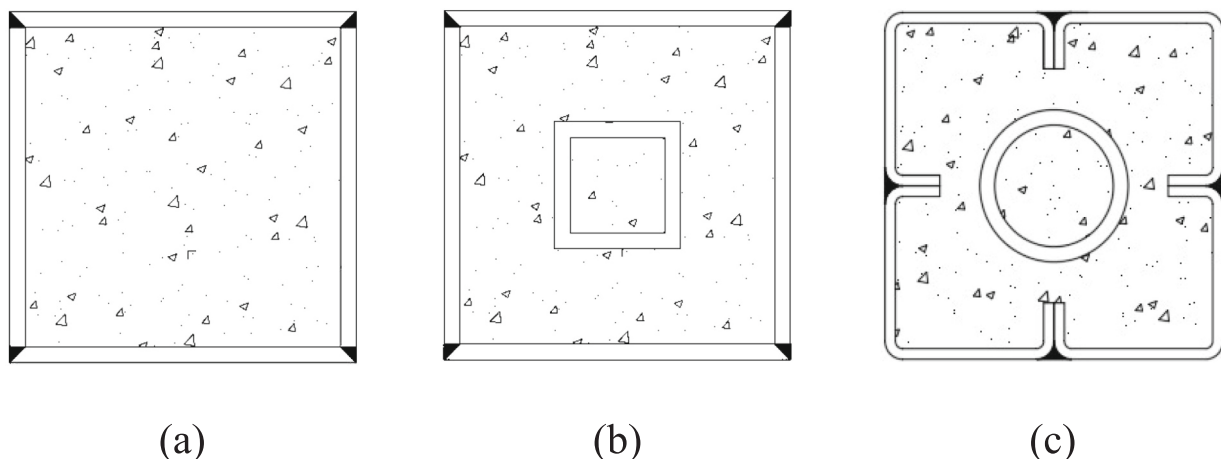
Typical cross-sections of composite columns including (a) CFST (b) CFDST and (c) CFDSST.
